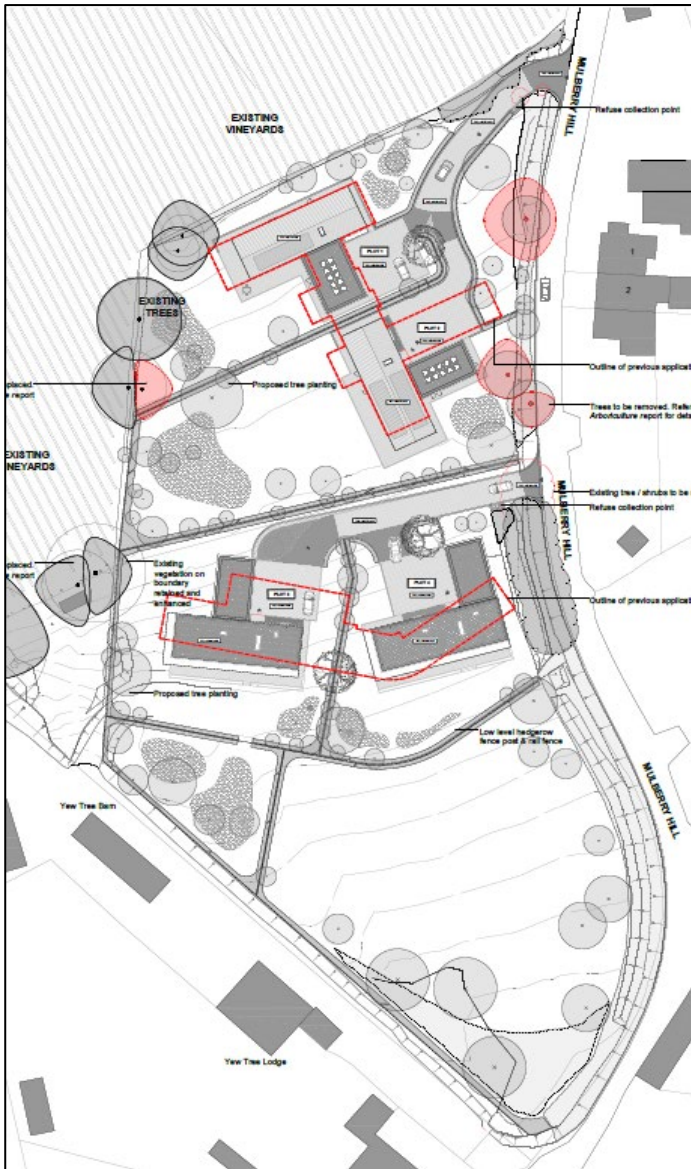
Drawing 18.012A 05 showing the proposed Site Masterplan
